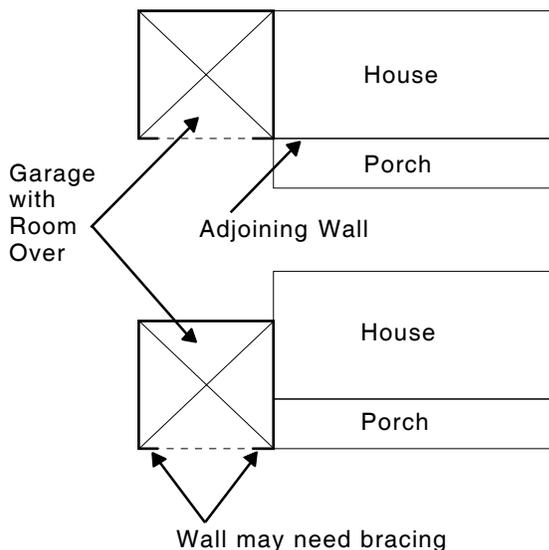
Additional bracing. If the wall of the main house is in line with the wall containing the door of a garage with a room over it (top figure), the adjoining wall will help brace the garage. If the “in-line” wall consists only of porch supports (bottom figure), the garage may require additional bracing.
